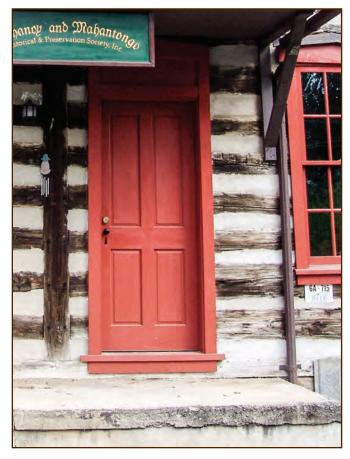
This photo shows one of the doors of the Zeigler house in Dalmatia, Pennsylvania. The site-constructed frame and panel door was built in a style that people commonly used before 1900.
